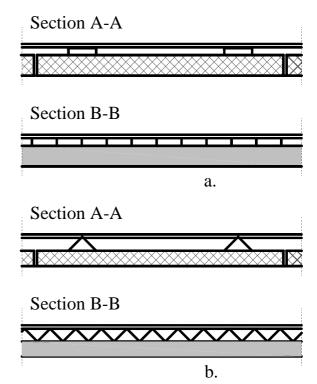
Intermediate floors using stirrup and trigon type connectors [2]
